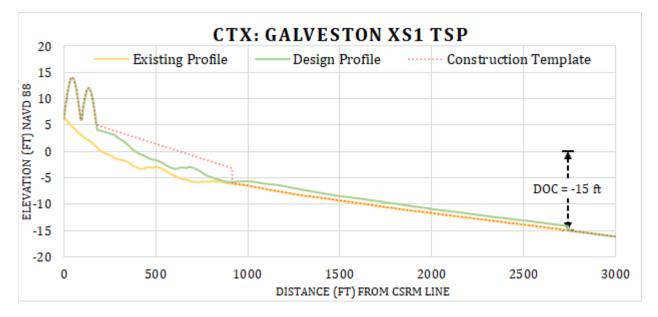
Galveston XS1 TSP; Construction template volume = 7.5 cyd/ft, top elev. at +5', slope at 1:90
